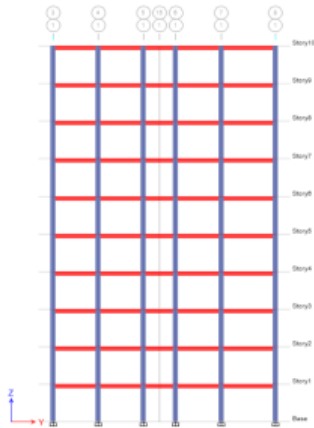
, Elevation of RCC Re-entrant corner irregular Structure
